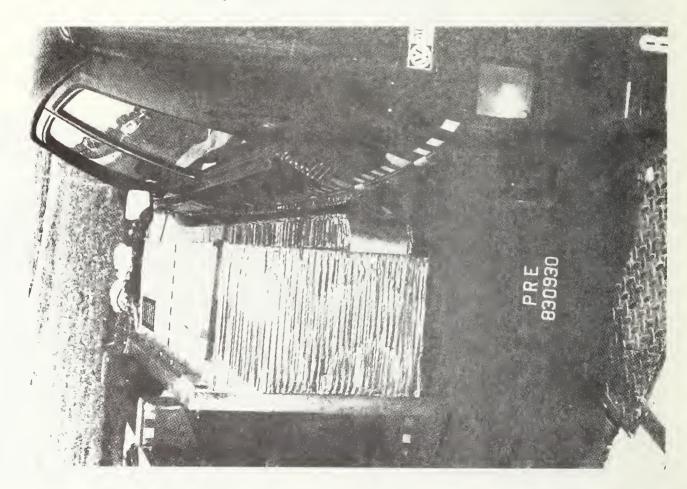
PRE-TEST CLOSEUP - VIEW 2
